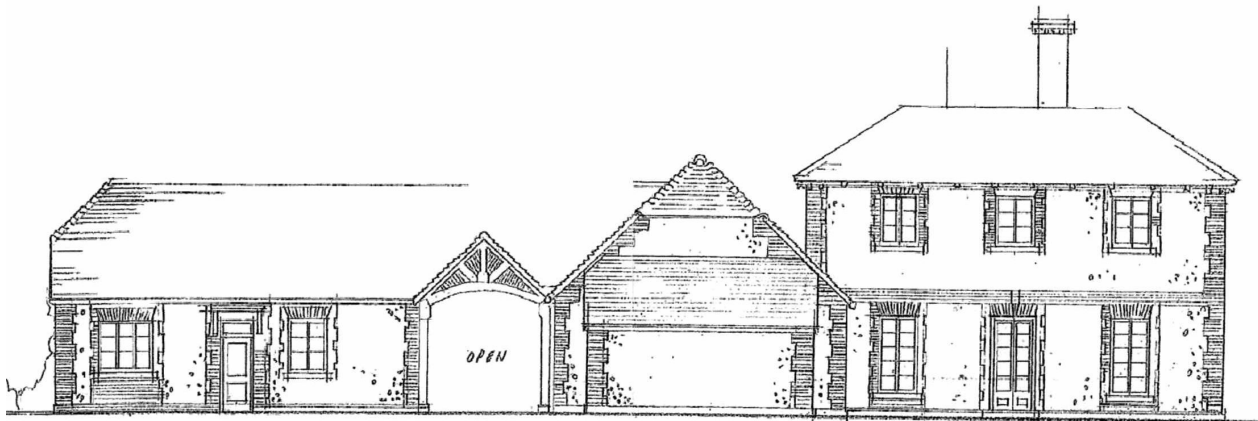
(below): Part elevations of the proposed new dwelling and outbuildings at Wansdyke Dairy Farm (not to scale)
